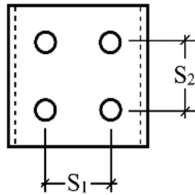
SWP46/SWP6X/SWP8X SERIES, REBAR PLACEMENT GEOMETRY, AND INSTALLATION
